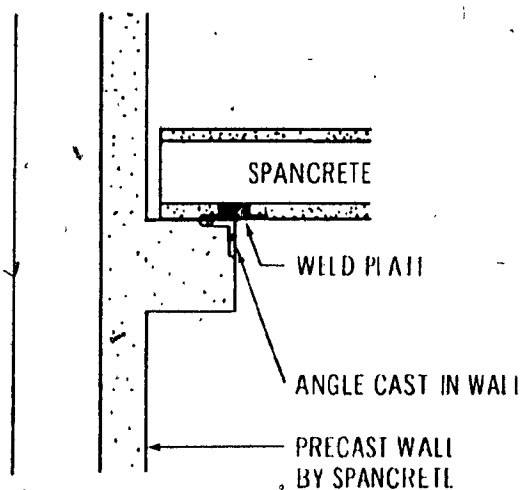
Hollow-Core Slab-To-Masonry Wall Connections.
